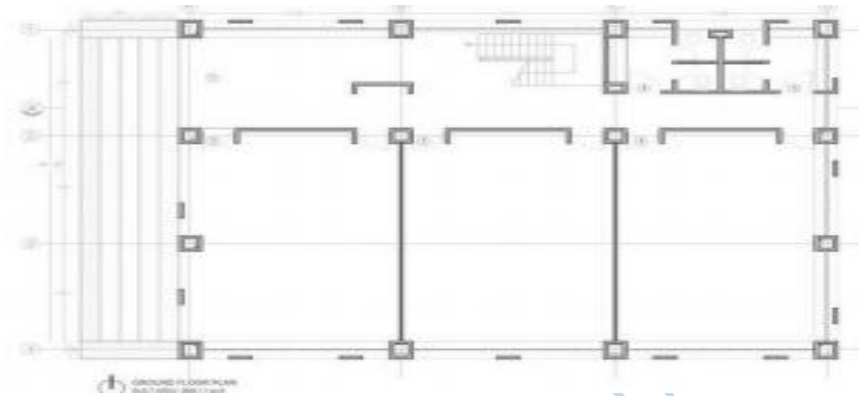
Floor Plan of Dhaka International University Administrative Building (Google Search)
